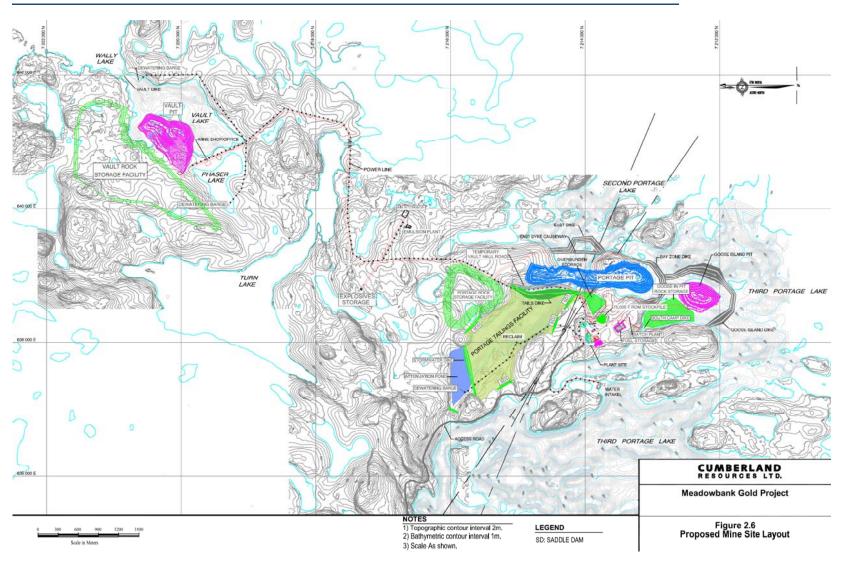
Original FEIS approved site layout. Note Vault Pit, Phaser Pit and BB Phaser Pit and Waste Rock Storage Facility are smaller in surface area than the current mine plan than what is was approved in 2008
